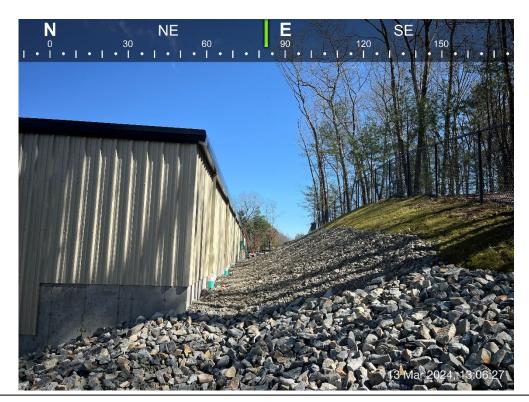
Looking between Buildings #3 & #4. Stabilized, compacted gravel in place.
